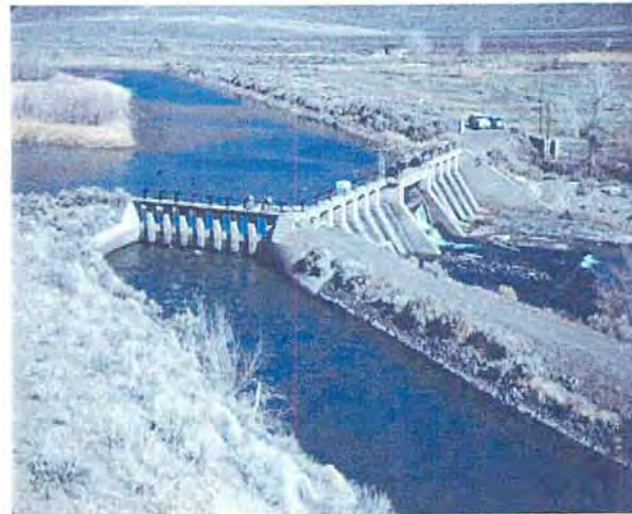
View of Derby Dam and the Truckee Canal headworks.
